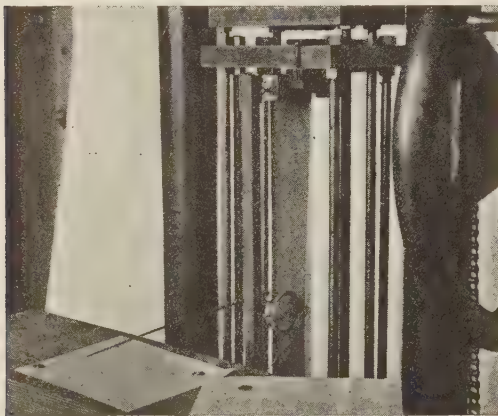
VIEW OF SPECIMEN IN MACHINE, SHOWING CARRIAGE AND SCALES FOR READING LATERAL DEFLECTIONS
